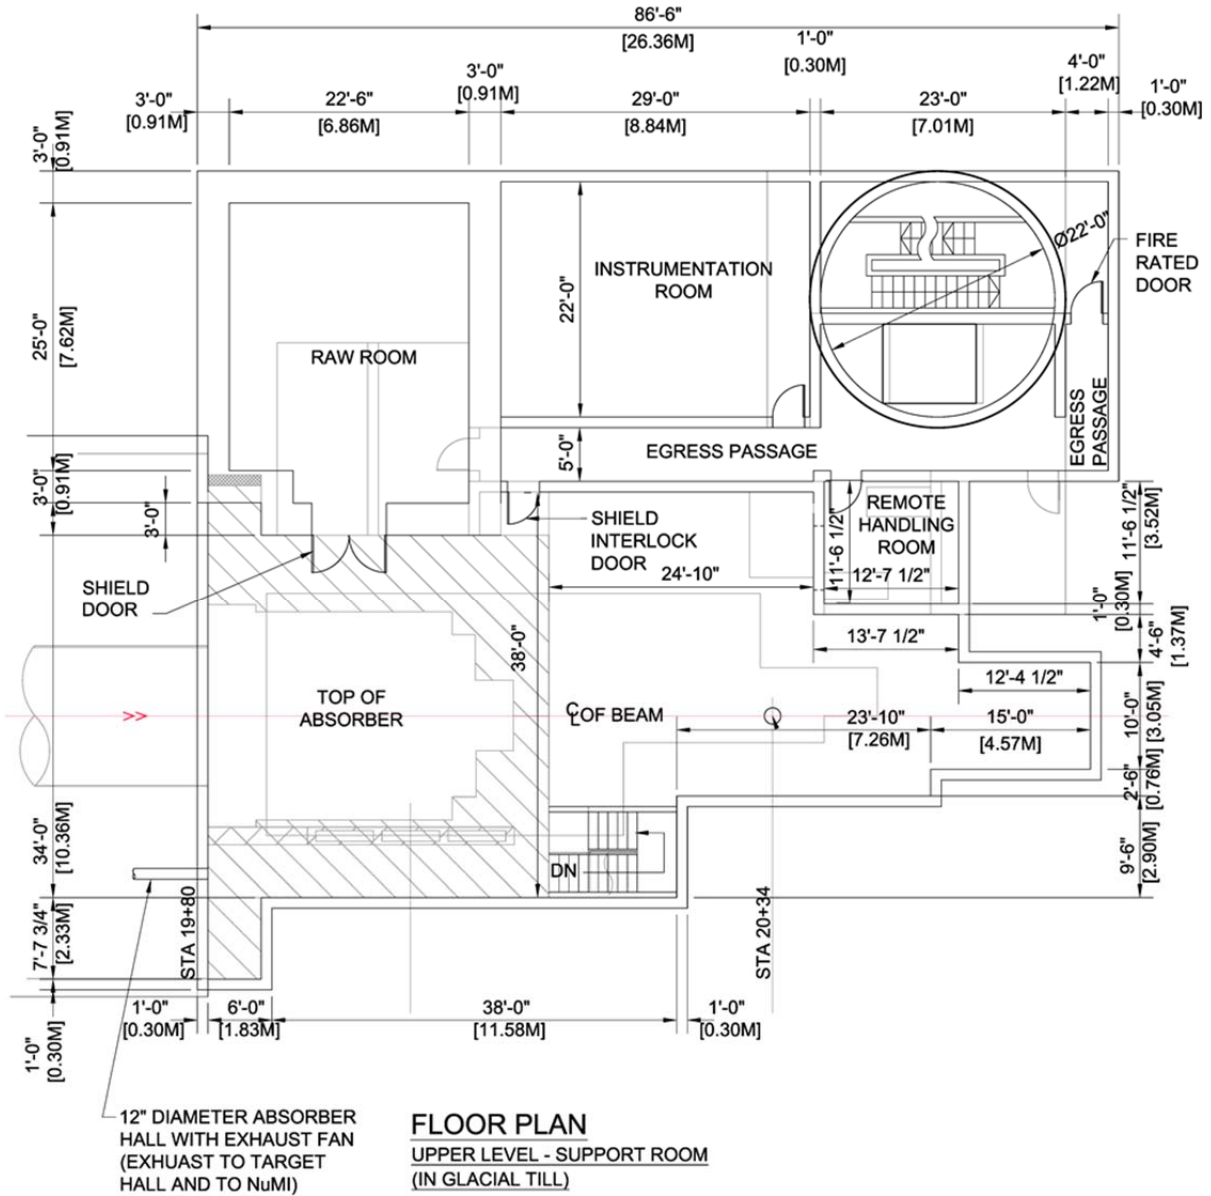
Absorber Hall. Upper Level plan view in soil.
